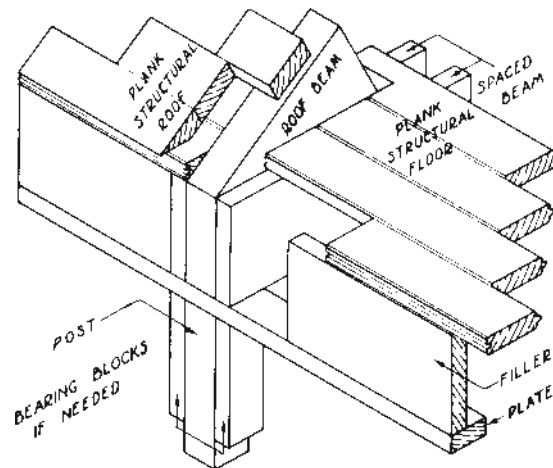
Solid Beam at Second Floor Over Interior Post
